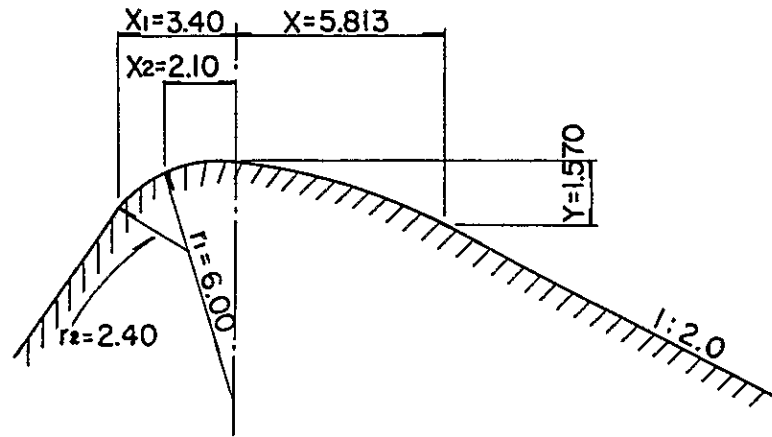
Shape for Ogee Crest (Sub Dam)
